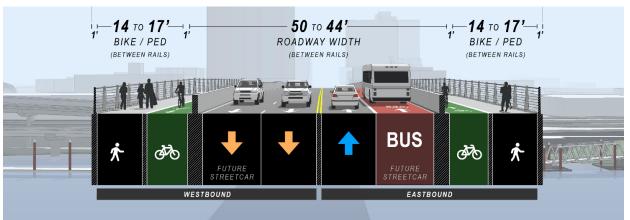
Preferred Alt Lane Configuration (West Approach Shown; Others Similar)
